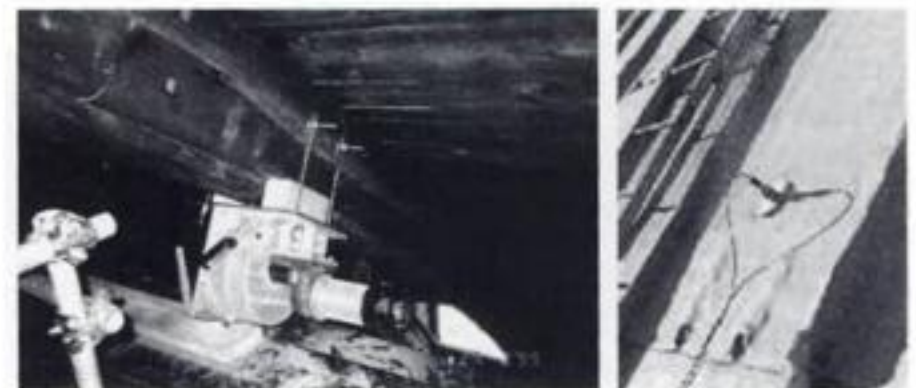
Positioning of the exciter on an internal rib of the roof and view of an accelerometer placed outside.
